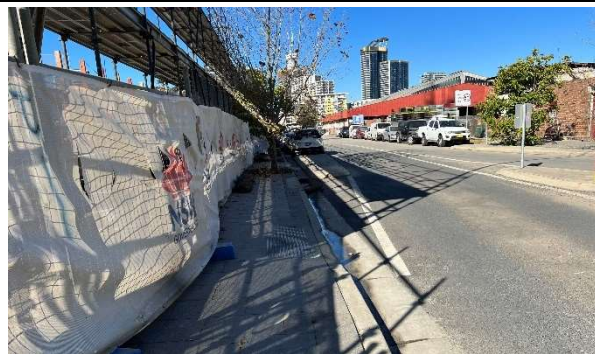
and 7: The exit point to the site onto Burroway Road was free of tracked sediment. The gutter to Burroway Road adjacent to the site, was free of sediment.
